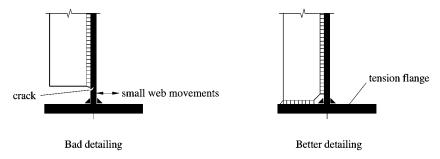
Connection of transverse stiffeners to a flange subject to tension.
